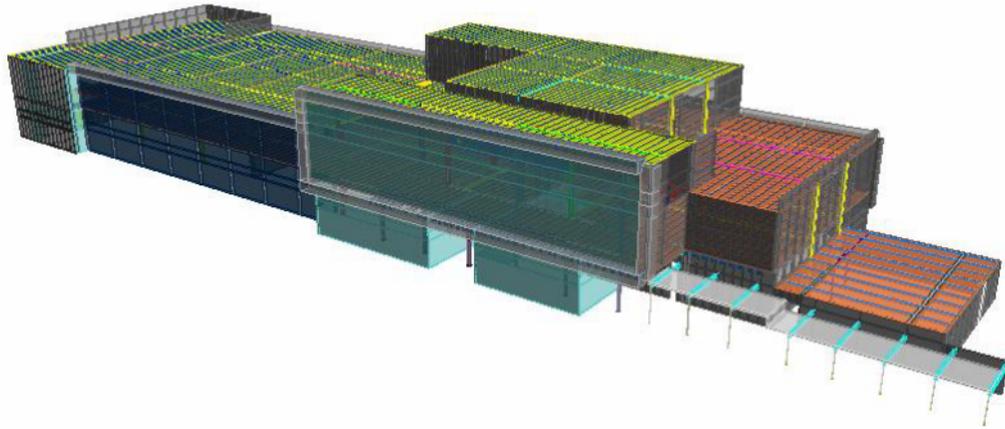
3D isometric view of the Main Building structural analysis model – North face
